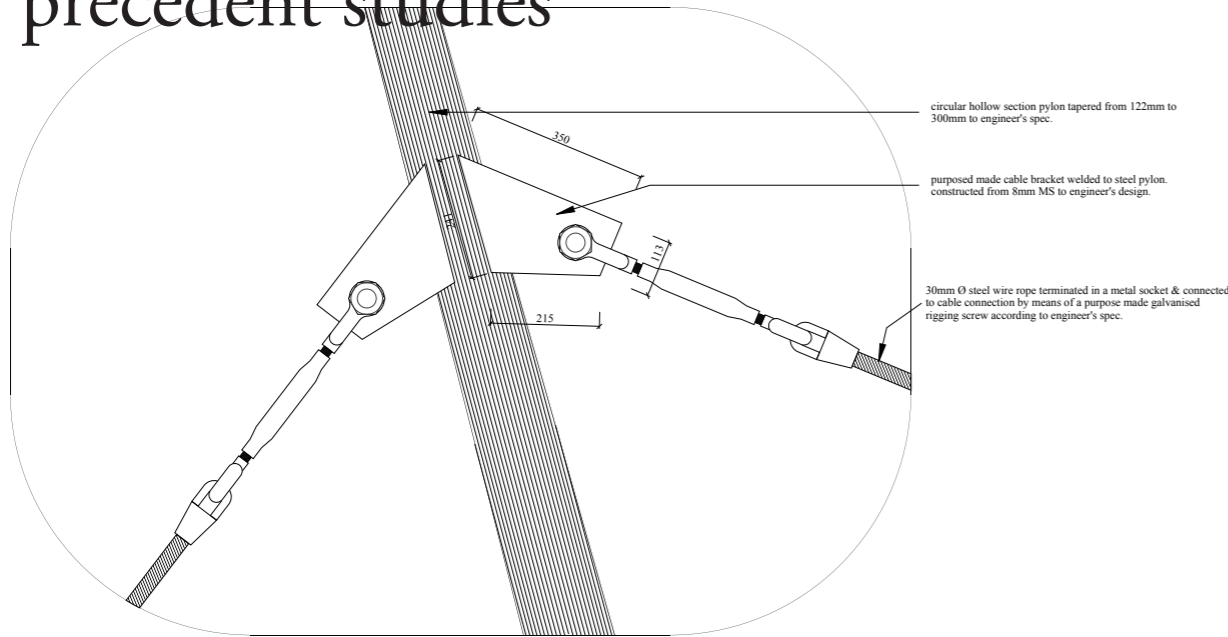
Detail D02: Detail of top pylon/cable connection.
